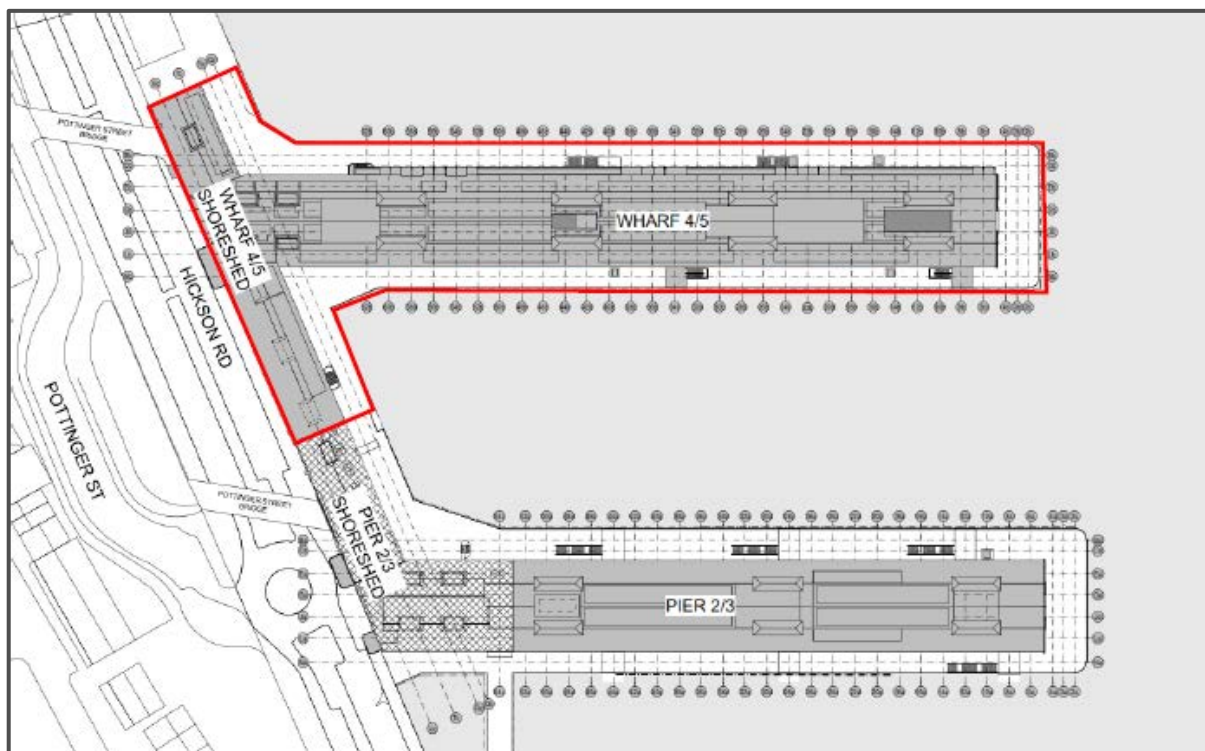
| Wharf 4/5 and Shore Shed 4/5 (Source: Applicant).
